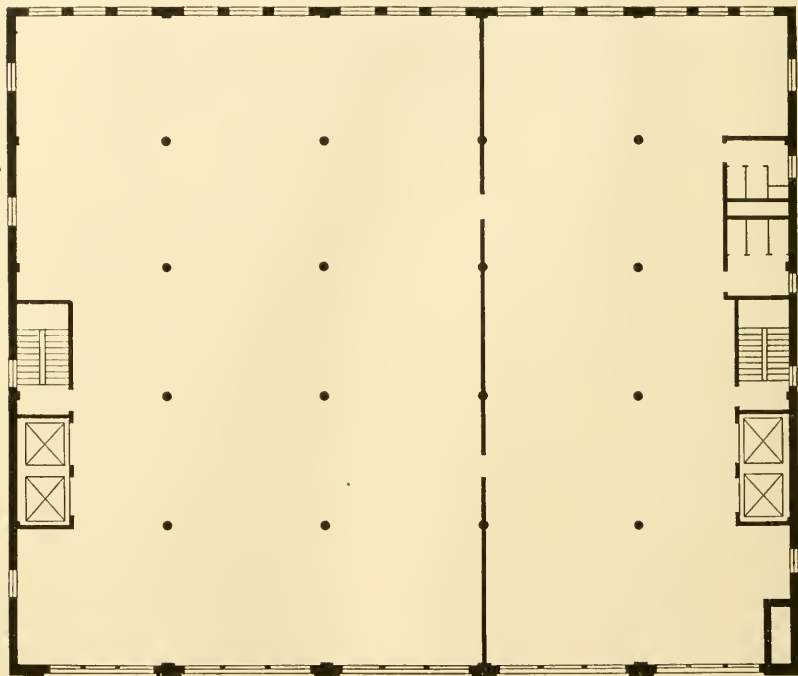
FLOOR PLAN OF TYPICAL LOFT BUILDING SHOWING FIRE WALL WITH DOORWAYS
